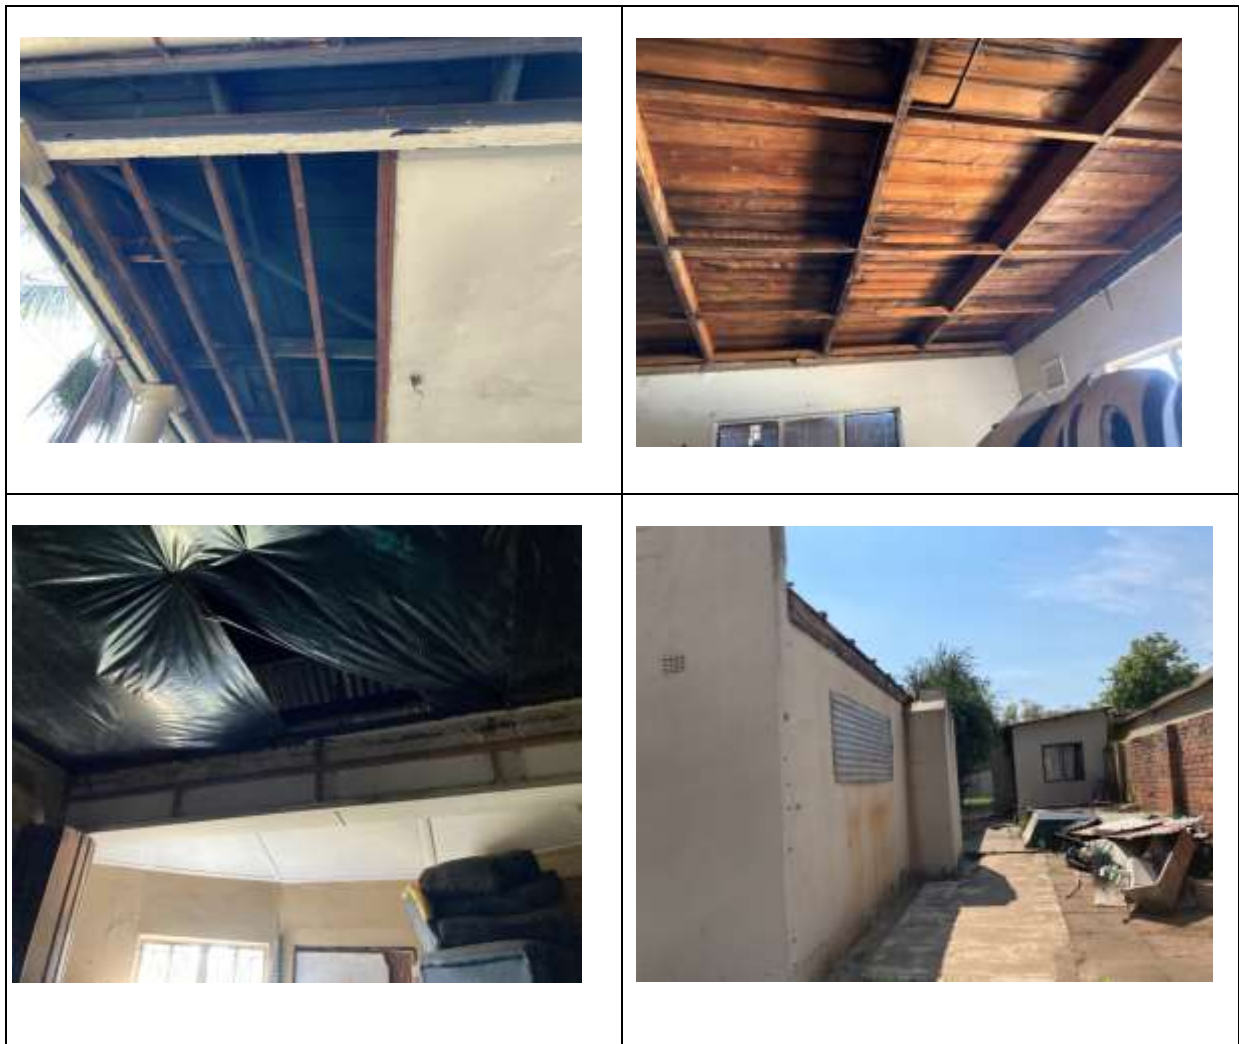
View of a modern door showing some of the alterations on the building. Observe the stripped ceiling suggesting that the original ceiling has deteriorated – further suggesting the old age of the property.
